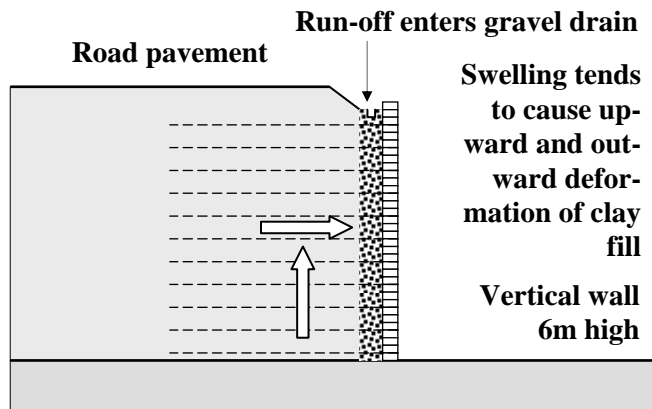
Suggested mechanism for facing failure at Jalan Veteran
